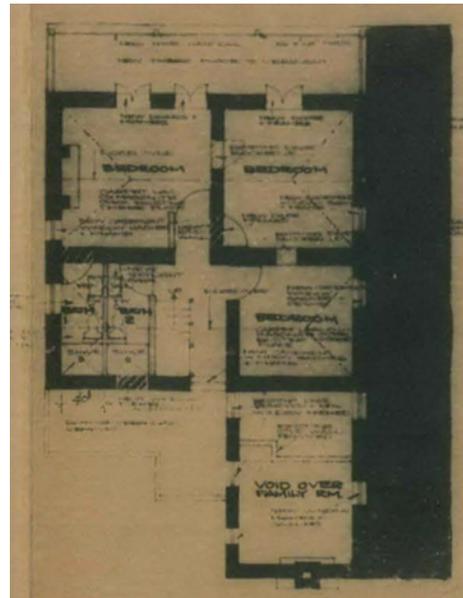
, First floor plan, Ian McKay Philip Cox, 08.01.1968
